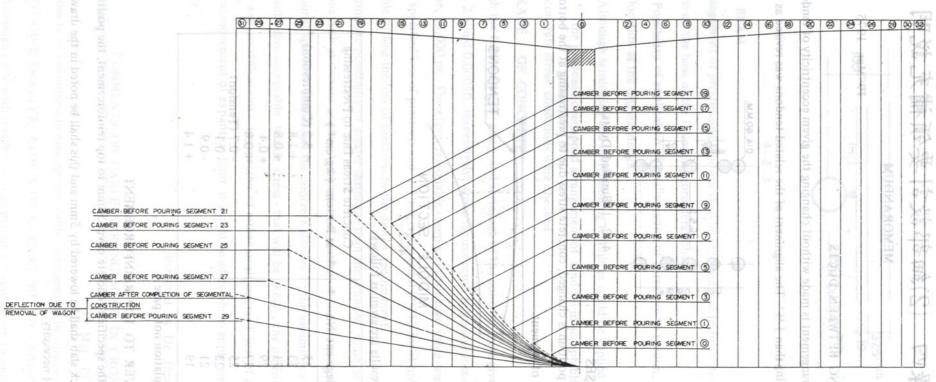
METHOD TO FIXE POSITION OF FORMWORK
